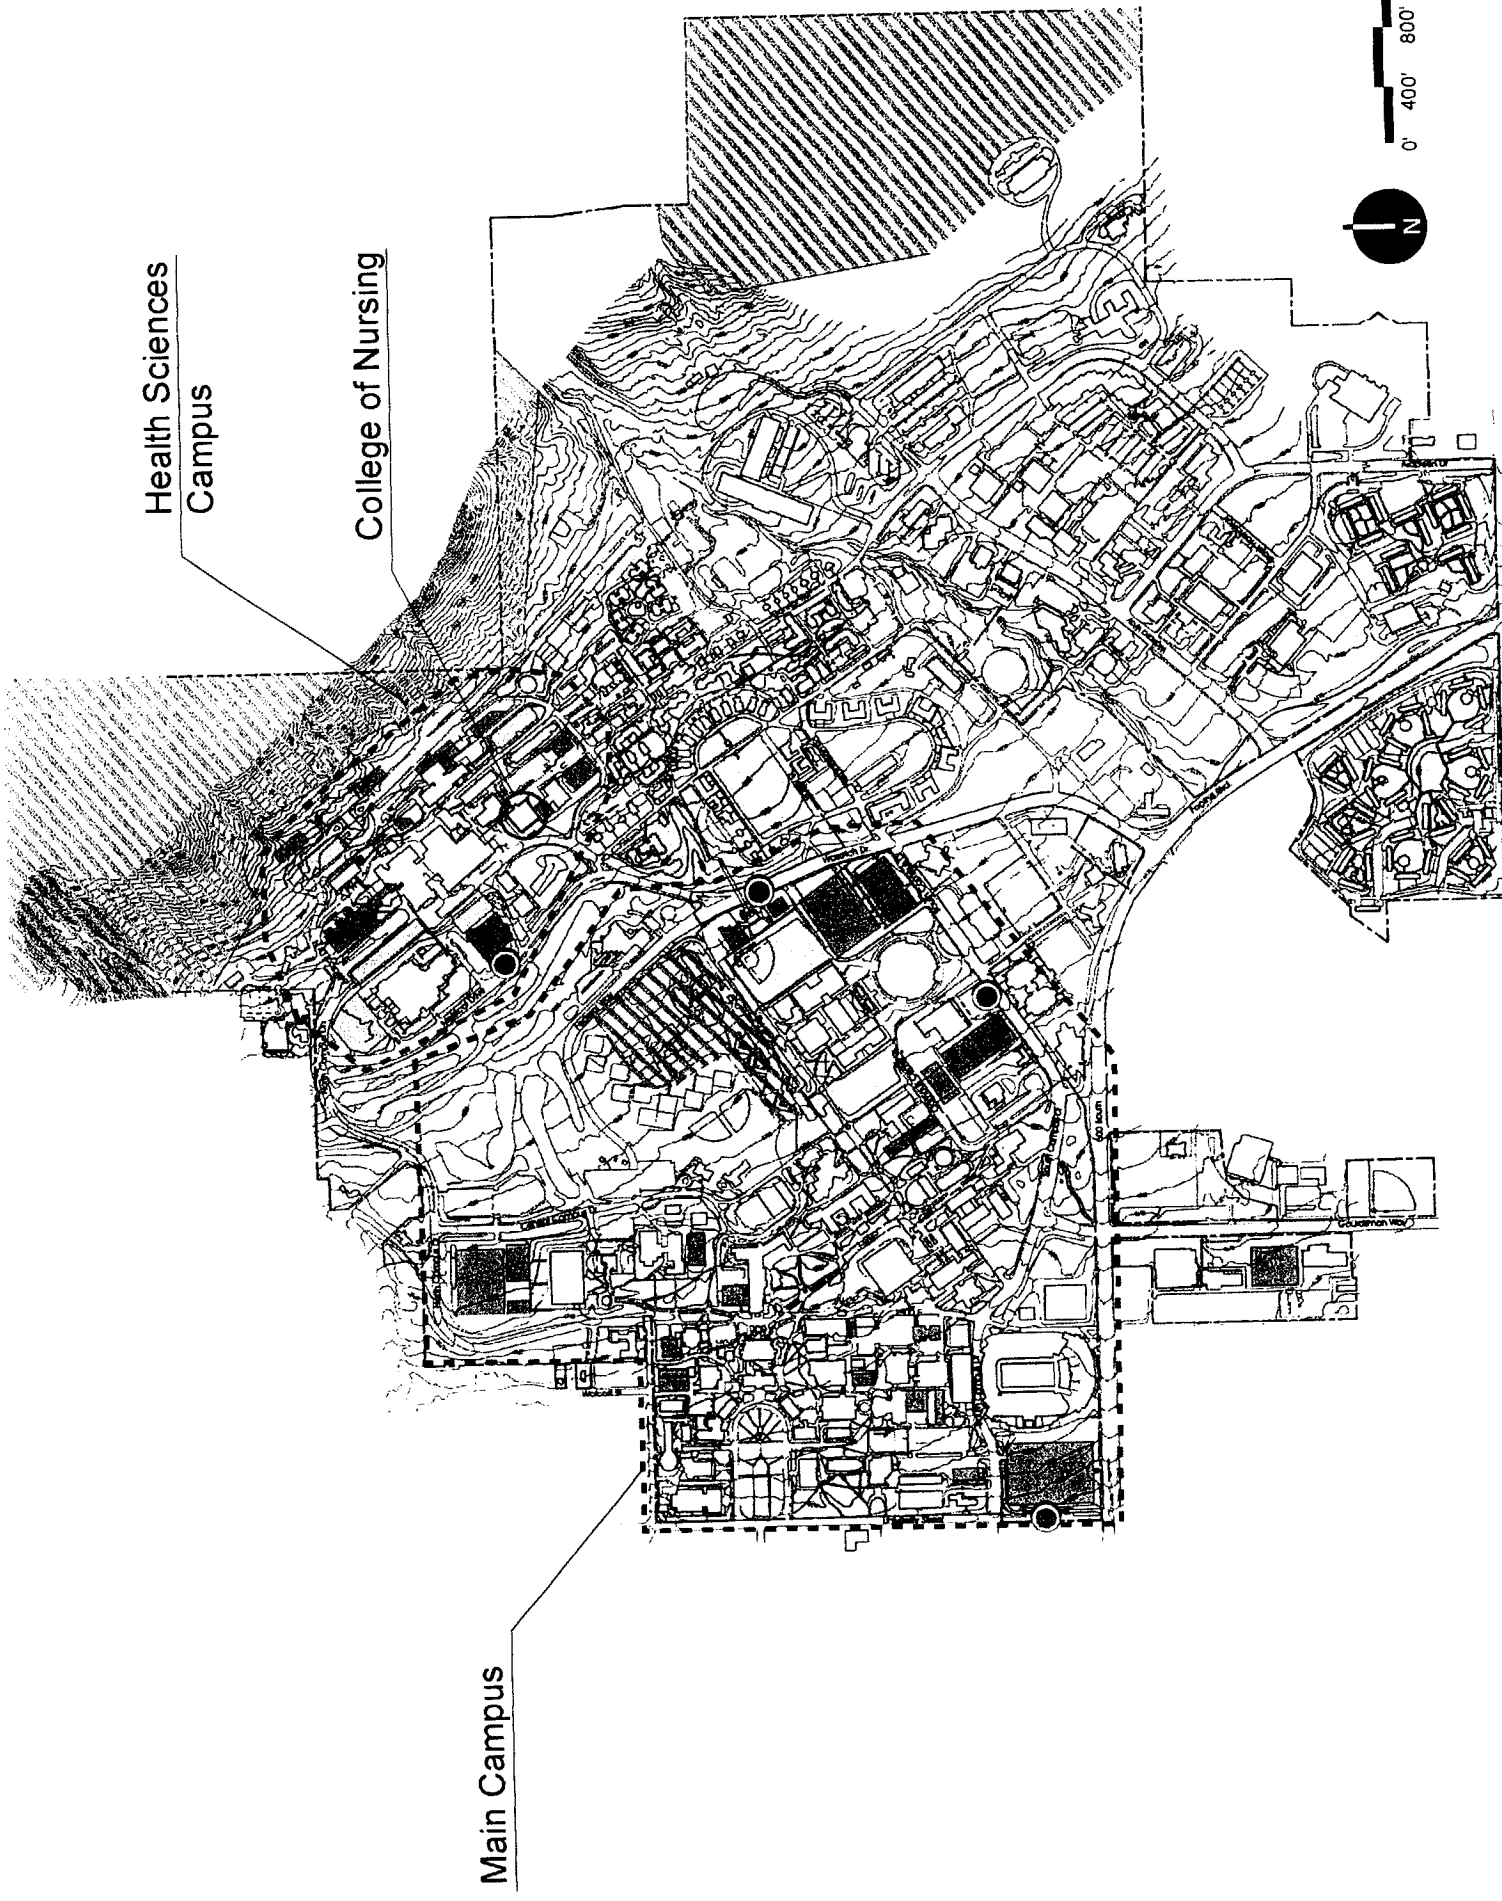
EXISTING SITE UTILITIES PLAN.
